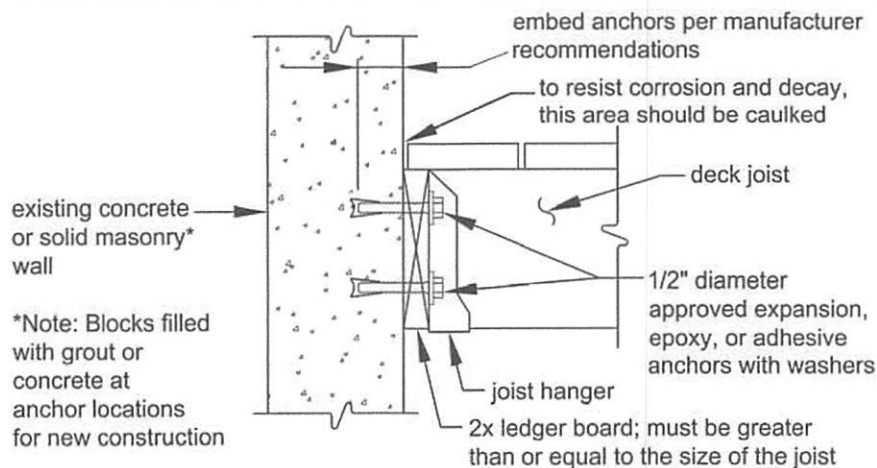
Attachment of Ledger Board to Foundation Wall (Concrete or Solid Masonry).
